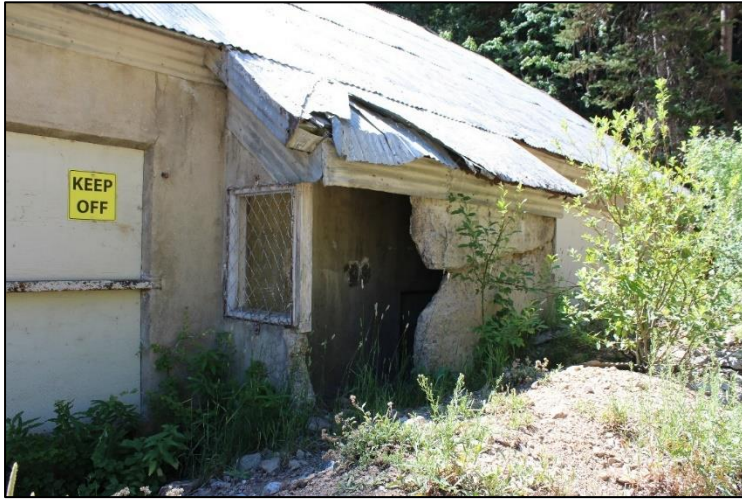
Entrance on northwest side of building, facing south. Note damaged roofing and deteriorated concrete, as well as earth piled against the building.
